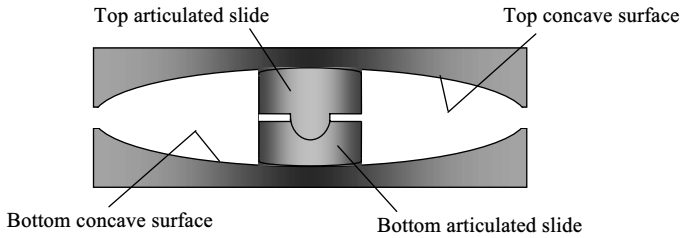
Friction pendulum bearing with double concave surface.
